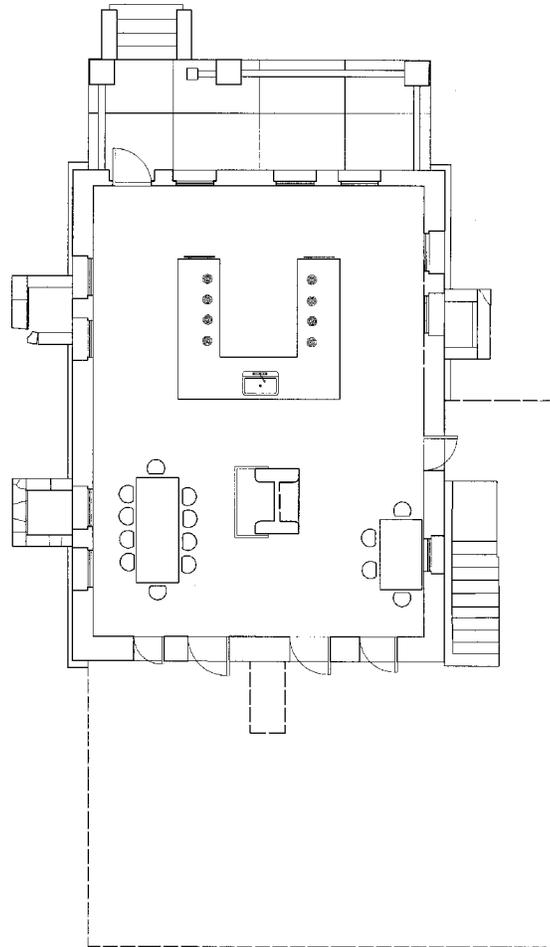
Figure X. Proposed rehabilitation: A possible plan. Note central work island and dotted line showing potential deck. North is at top. (Drawing by the author)
